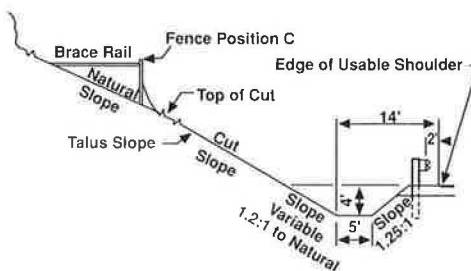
Roadway section on talus slope—Design B, fence position C.
